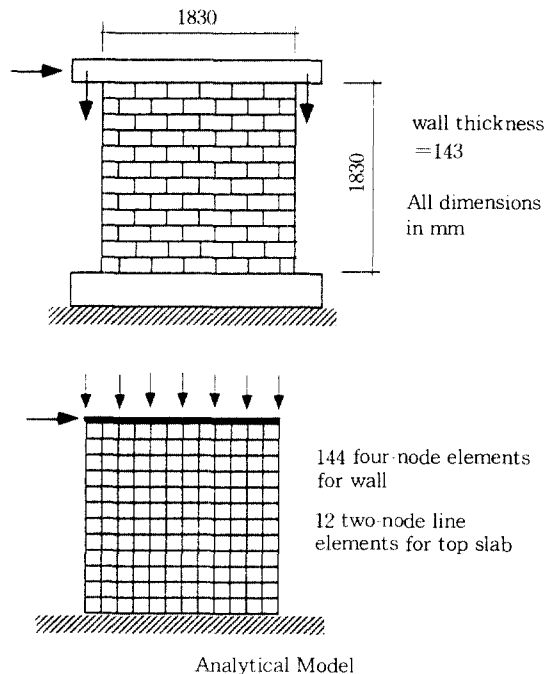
Reinforced concrete masonry wall tested by Shing et al.
